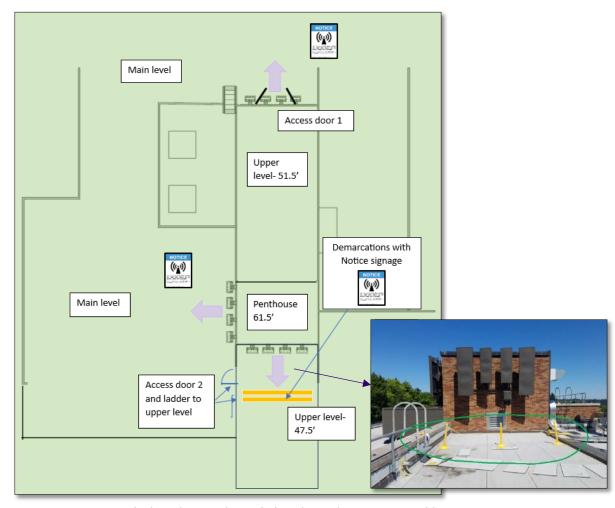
View looking down at the roof of Mechanical Engineering Building.
